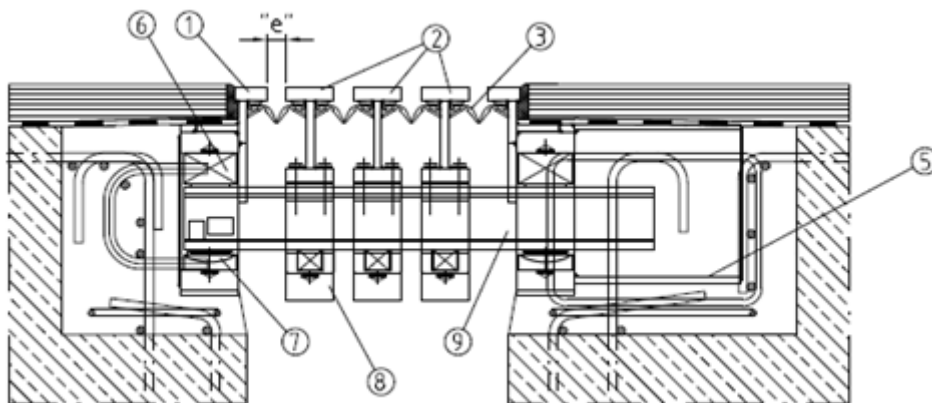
Cross section at carriageway with crossbeam of single crossbeam modular expansion joint with shear control elements between centre beams
